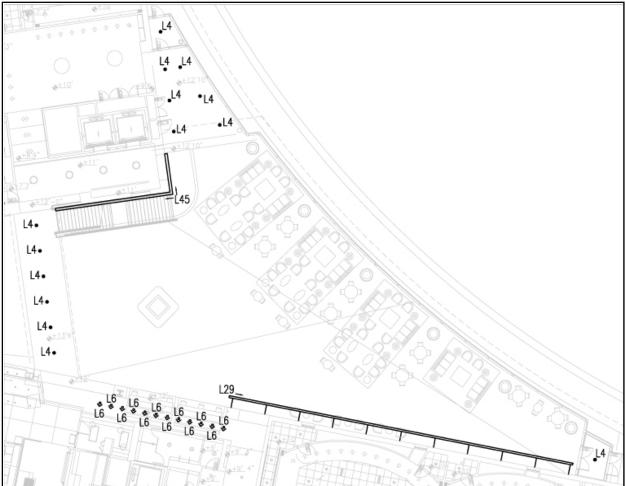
Atrium Lighting Plan And Furniture Layout, First Floor
